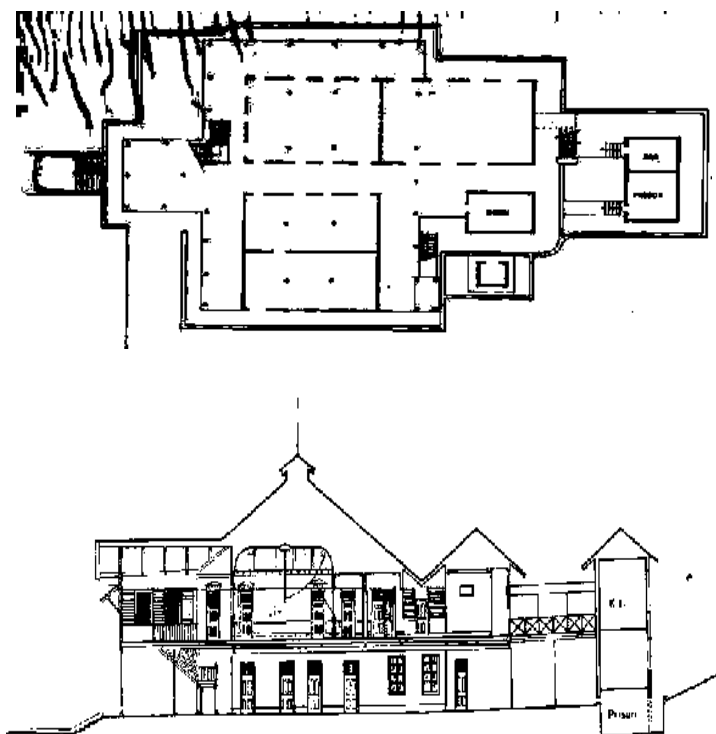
Old Residency (Ground Floor Plan, section & Elevation)
